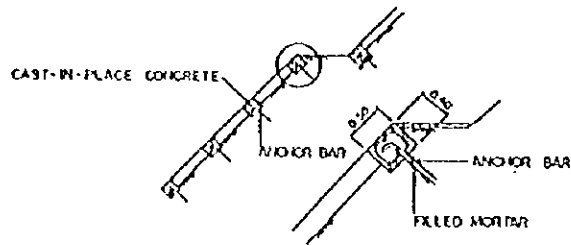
Cast-in-place Concrete Cribwork
